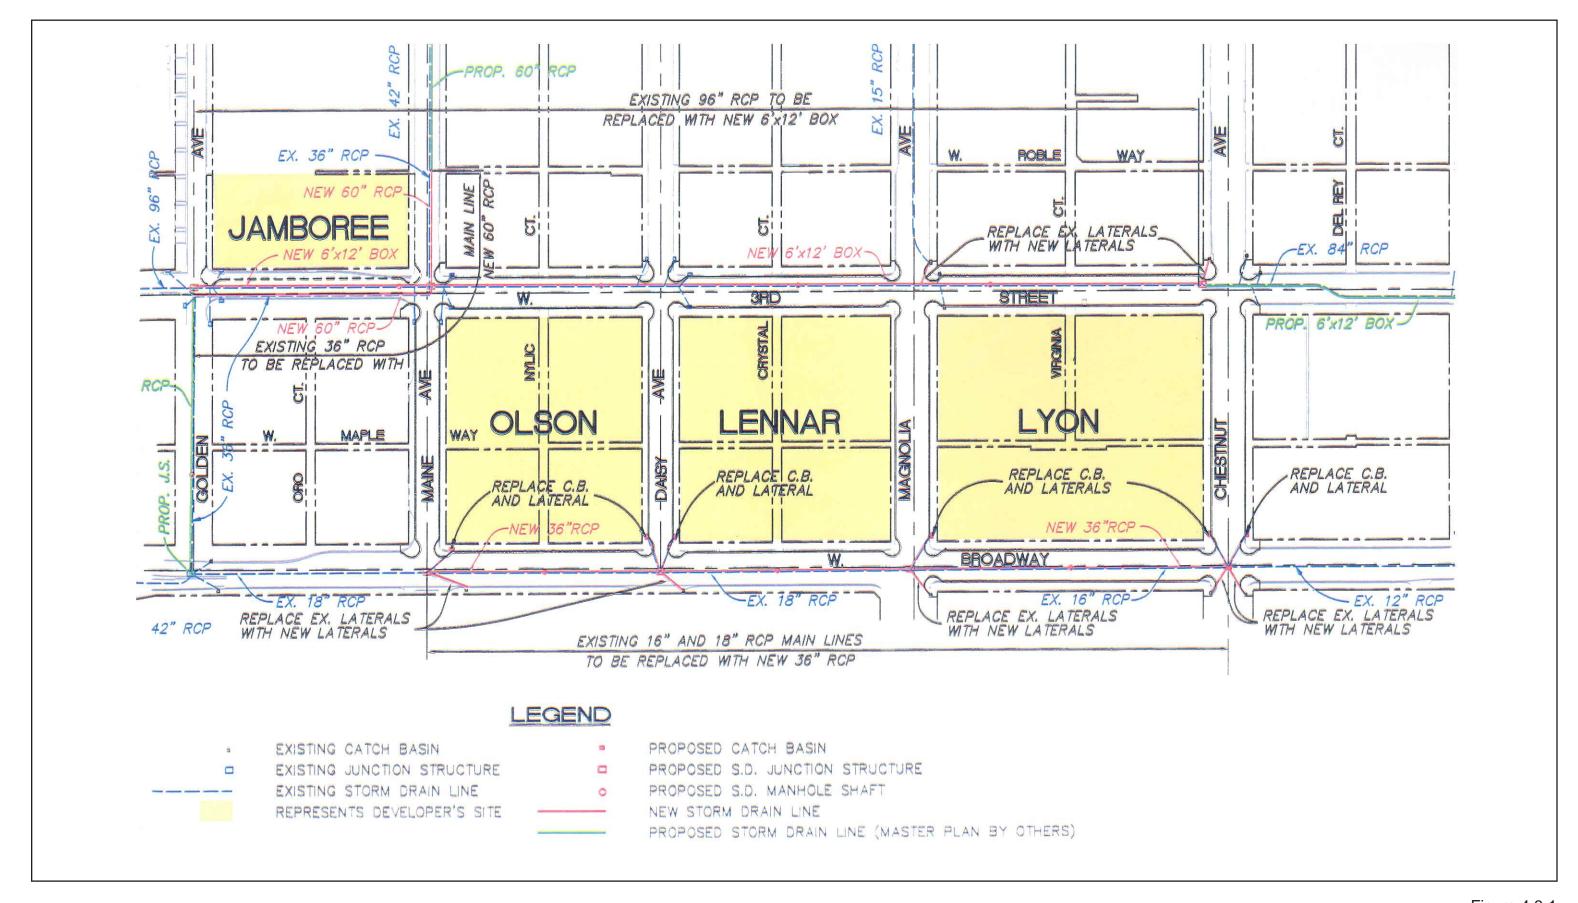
Proposed Drainage Plan for Parcels 9, 10 and 11
